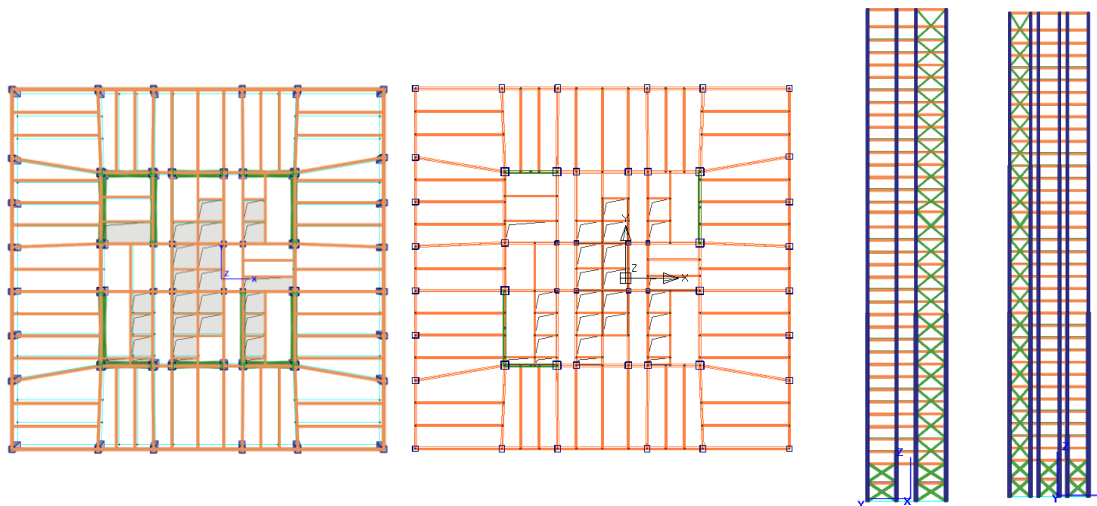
Chinese 37-story steel braced-frame structure (8-degree)
